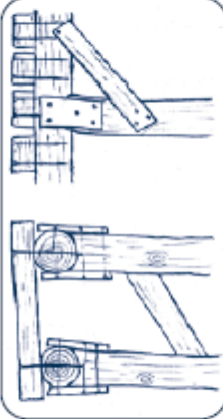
BRIDGE STRIMMER SUPPORT AND CROSS BRACING
